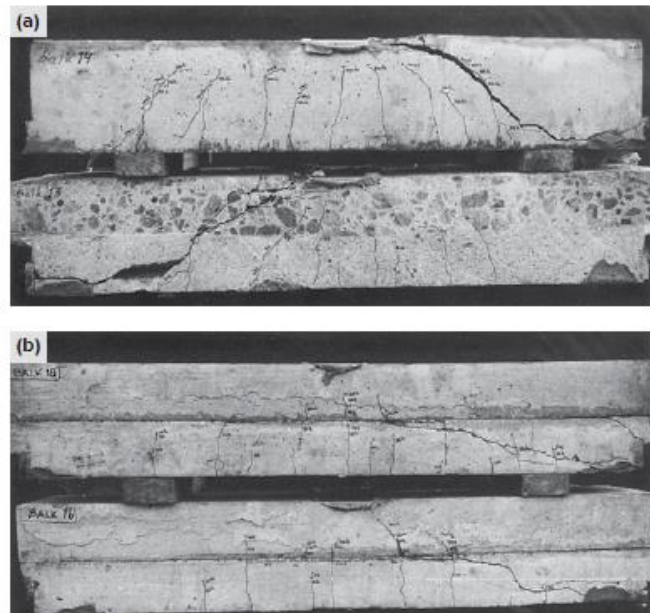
Photographs from Reference 8, showing four of the test beams listed in Table 1, after fatigue loading and subsequent static loading to failure: (a) Beam No. 14 (top) and Beam No. 13 (bottom) developed shear cracks through the full depth; and (b) Beam No. 18 (top) and Beam No. 16 (bottom) developed shear cracks only through the lower (reinforced) half after horizontal cracks developed at the interface between layers
